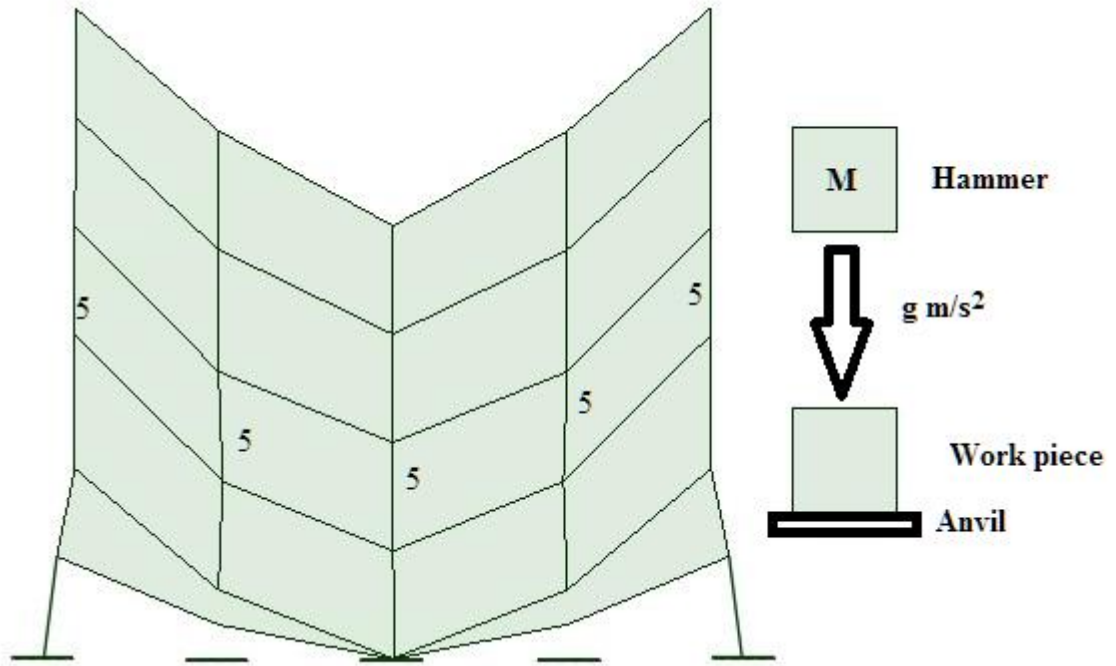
Location and Sequence of detonation to provide space for free fall
